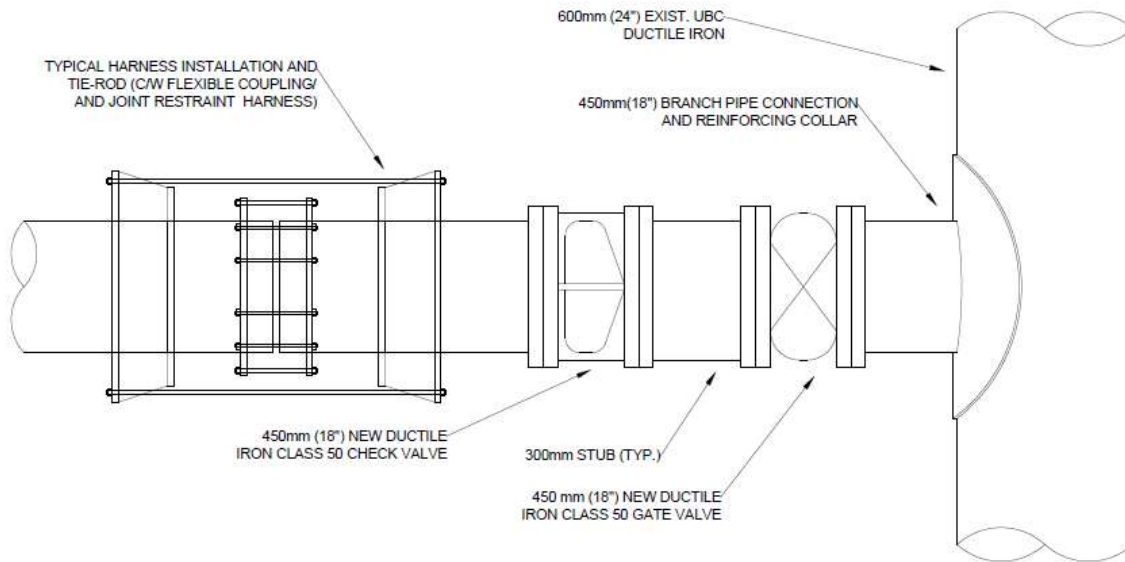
EXCERPT OF DETAILED OUTFLOW CONNECTION DESIGN
